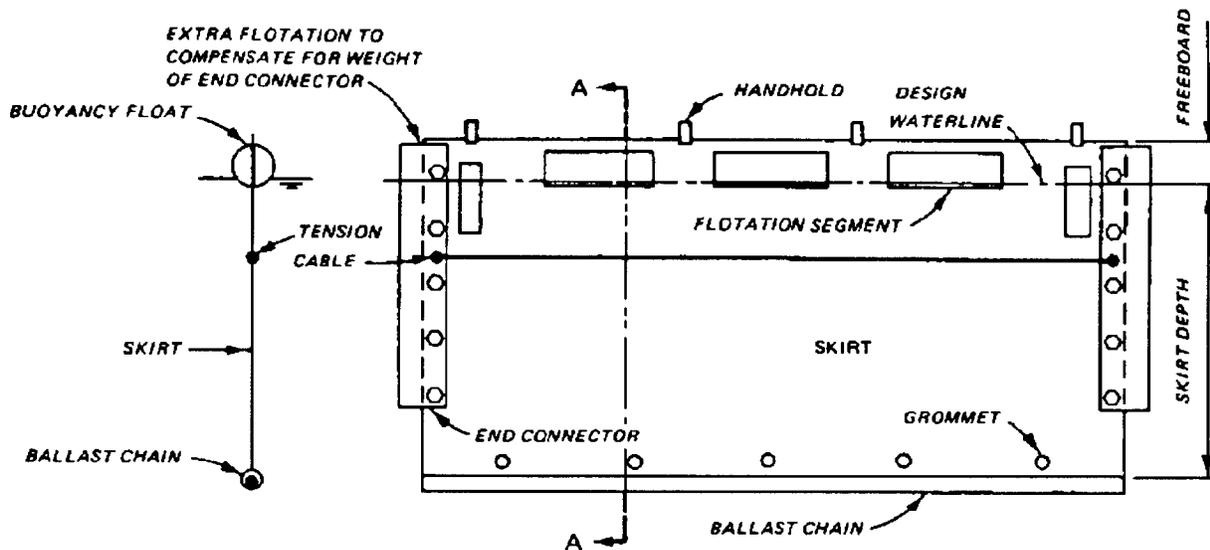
Construction of a Typical Center Tension Silt Curtain Section
